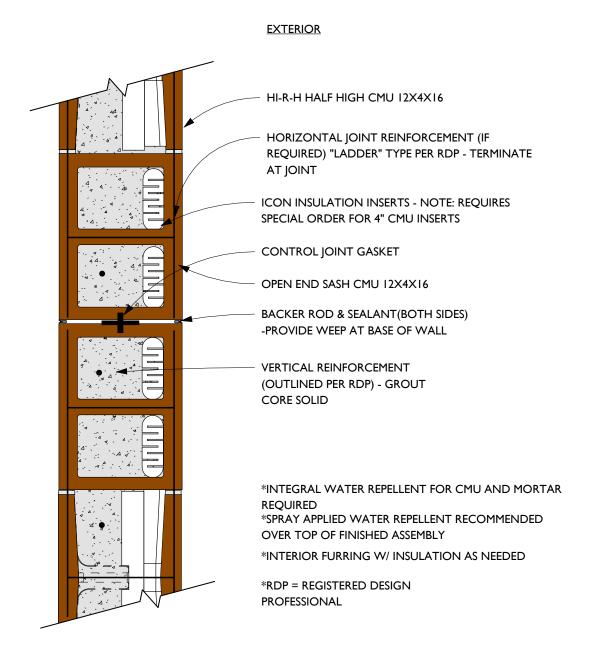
HI-R-H Half High - Piers, Control Joint and Jambs - Hooked Rein.
